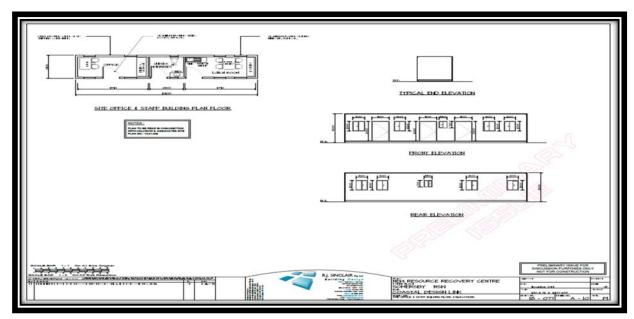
Site Office and Staff Building Floor Plan and Elevations
